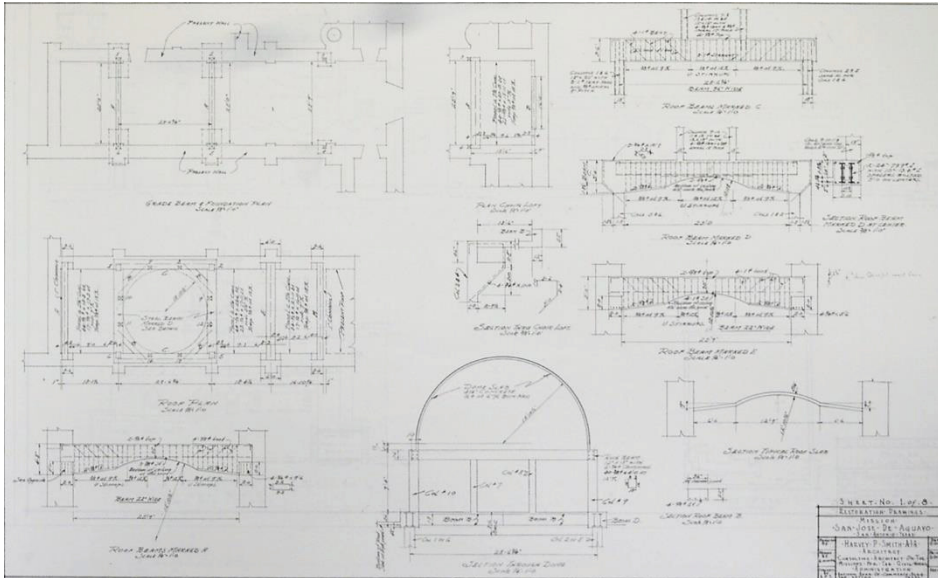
Restoration drawings by Harvey Smith. Details of the elements in reinforced concrete and scheme of the new dome. (1934). (NPSSA)
